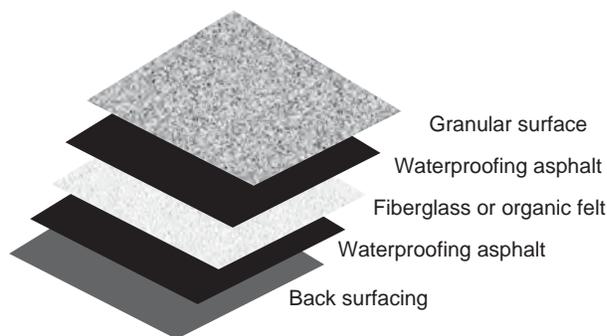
Typical composition of roofing shingles (after Gevrenov 2007).
